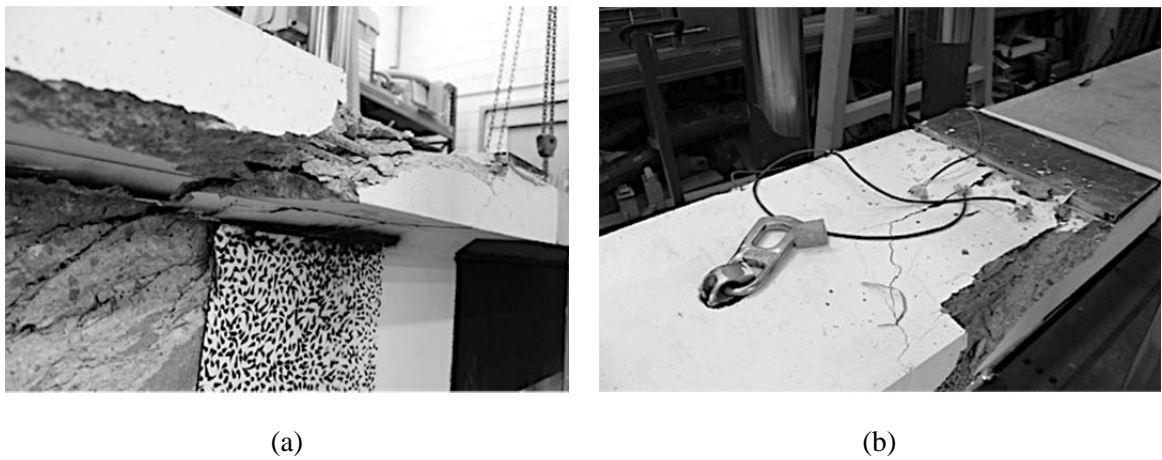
Anchored U-wrap specimen MB2UA after testing: (a) crack propagation into the slab detail, (b) slab failure mode.
